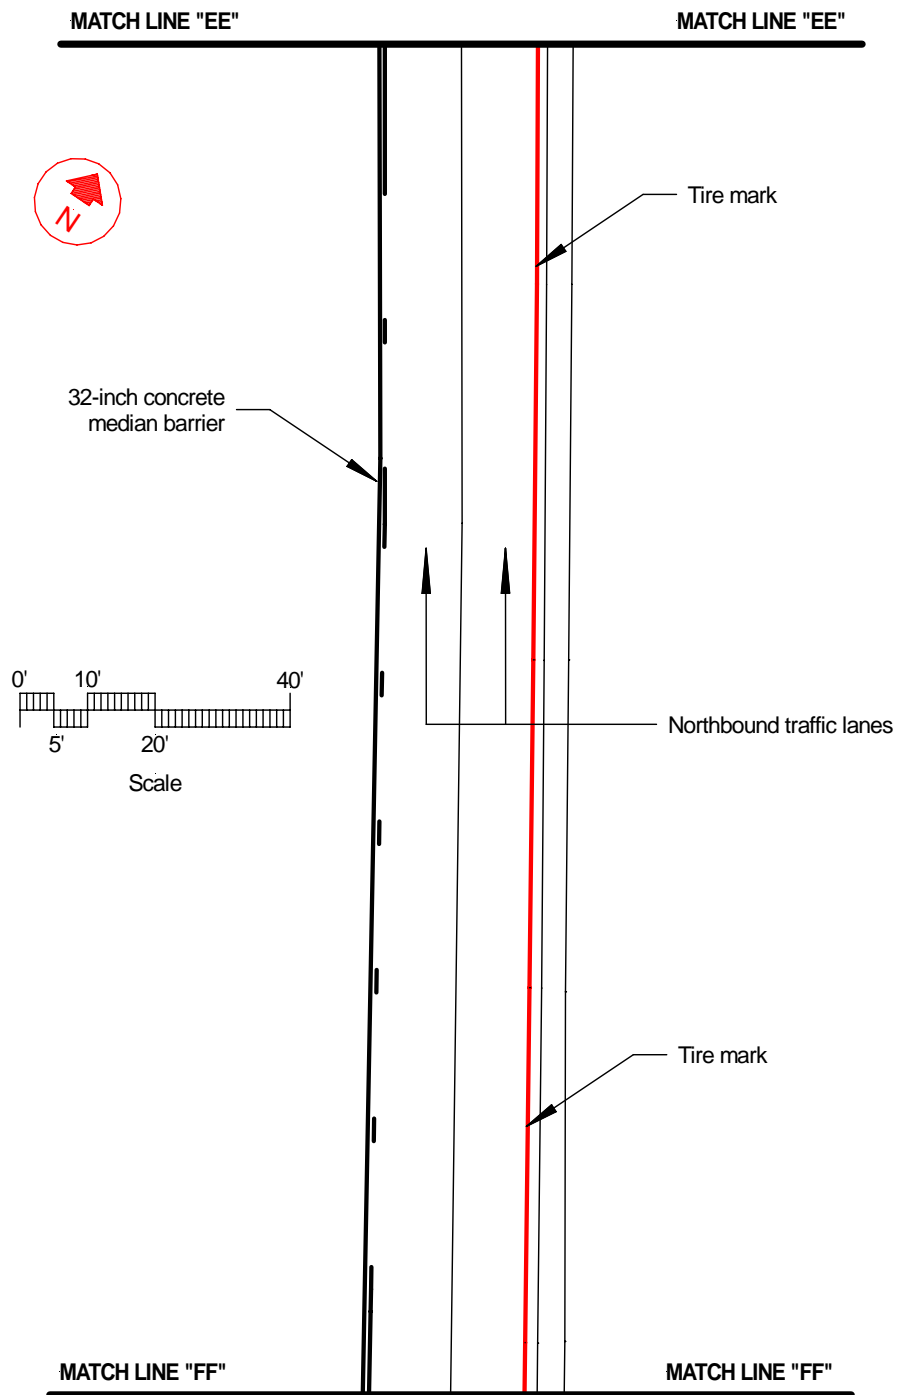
NTSB map of EE-FF pavement markings and roadway evidence.
